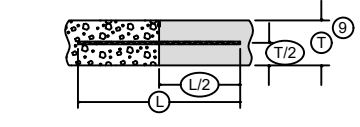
STANDARDROADPLAN PV-101 SHEET 3 OF 8
